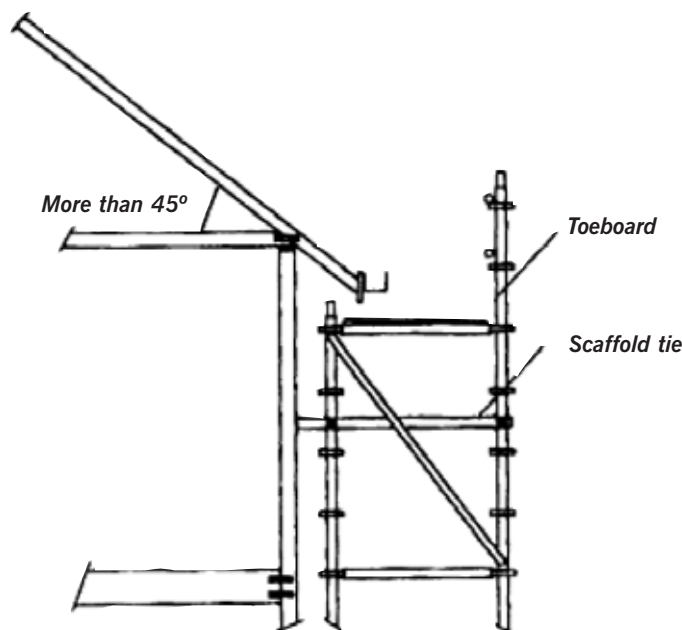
Scaffolding as edge protection for roofs greater than 45° pitch.
